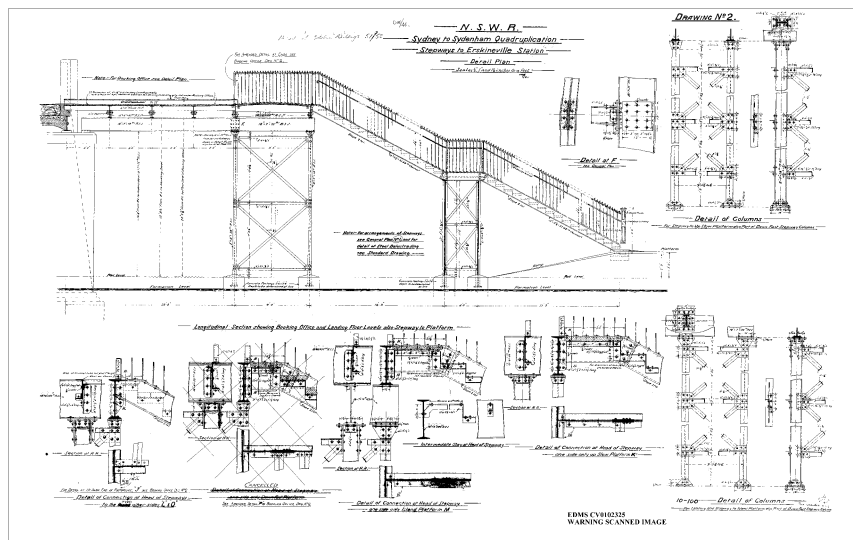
1911 plans for Erskineville Station stepway from overbridge to station
